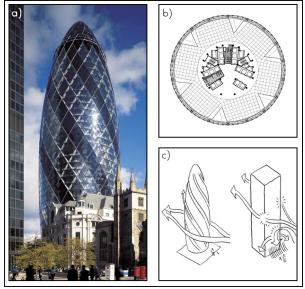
Building at 30 St Mary Axe, London, 2004: a - view; b - floor plan; c - diagram of the airflow around the building
